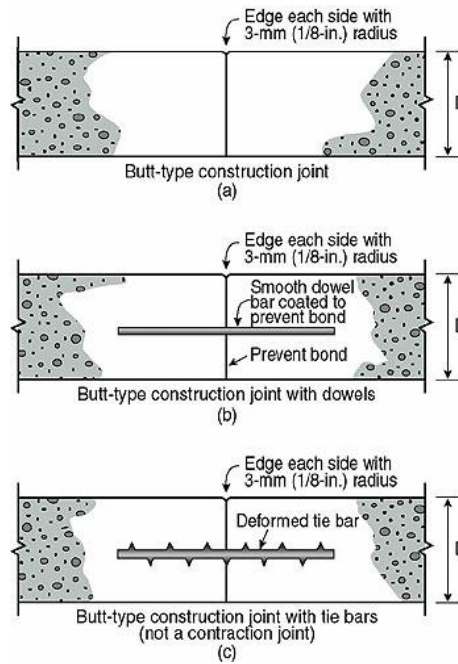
Section view of typical construction joints (Source: Day, 2020)
